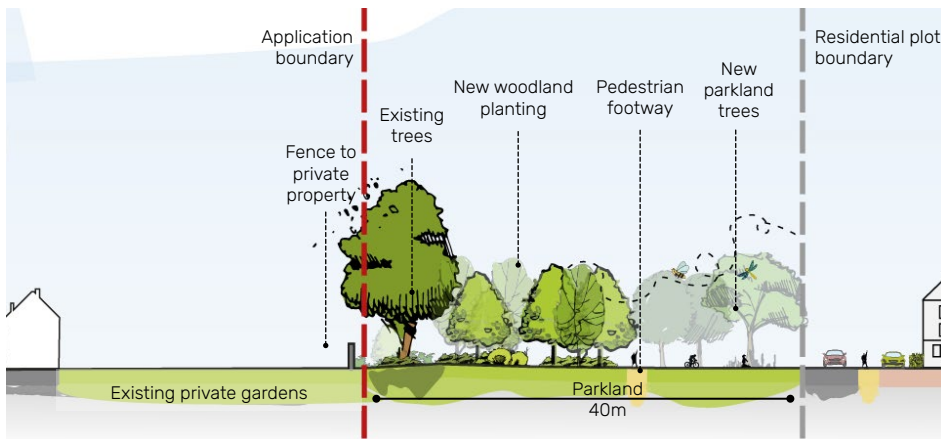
Section A-A Interface with existing urban areas (Leverstock Green)
